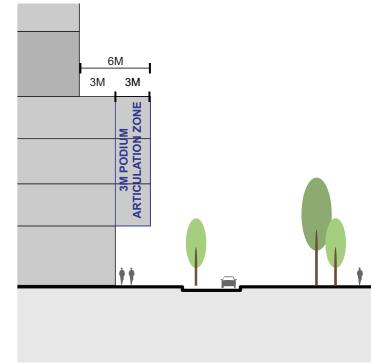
Podium Articulation Zone - Ground floor Setback
